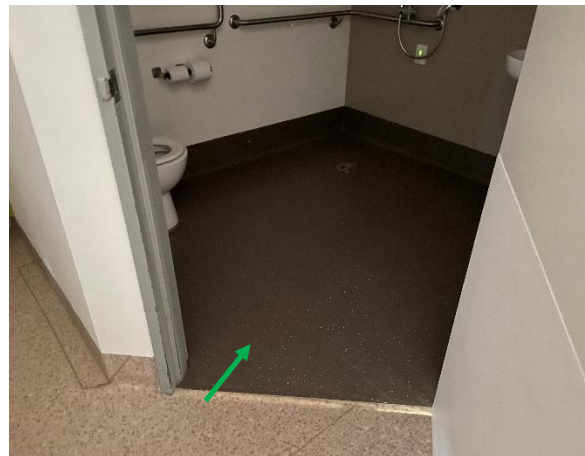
Sub-acute rehabilitation unit, patient bathroom floor – Non-asbestos containing maroon speckled vinyl sheeting
